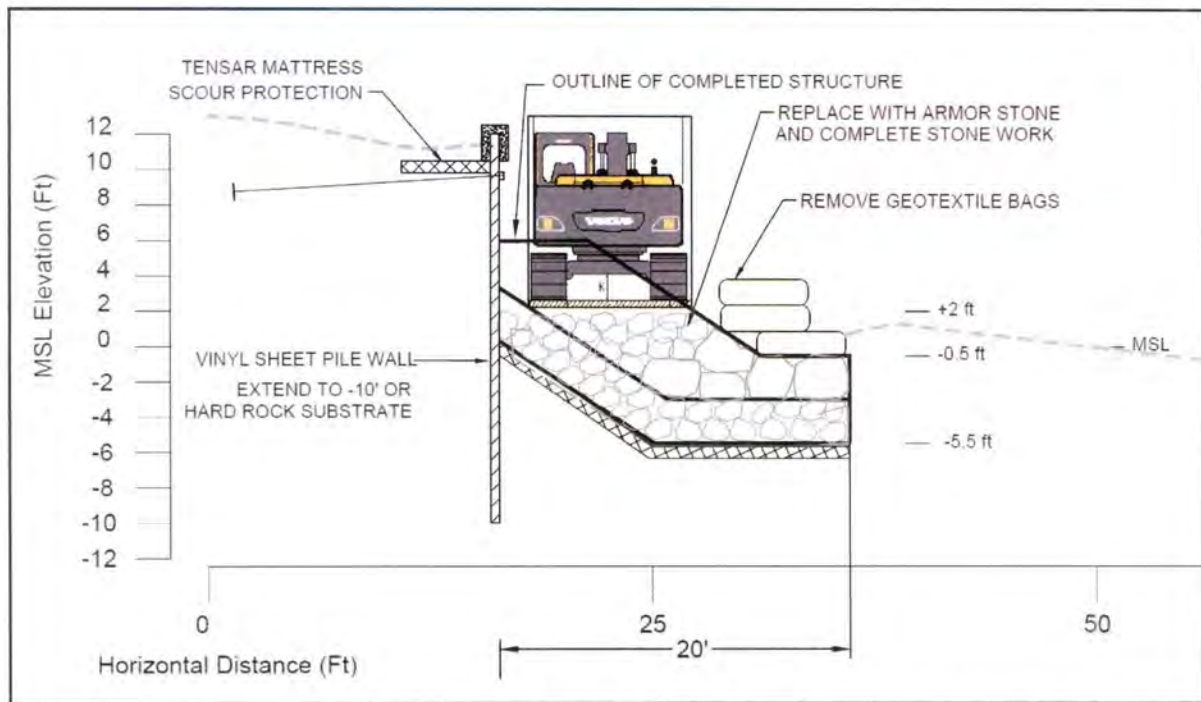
Construction of remainder of structure, removal of temporary shoring – Phase 2, construction moving north
